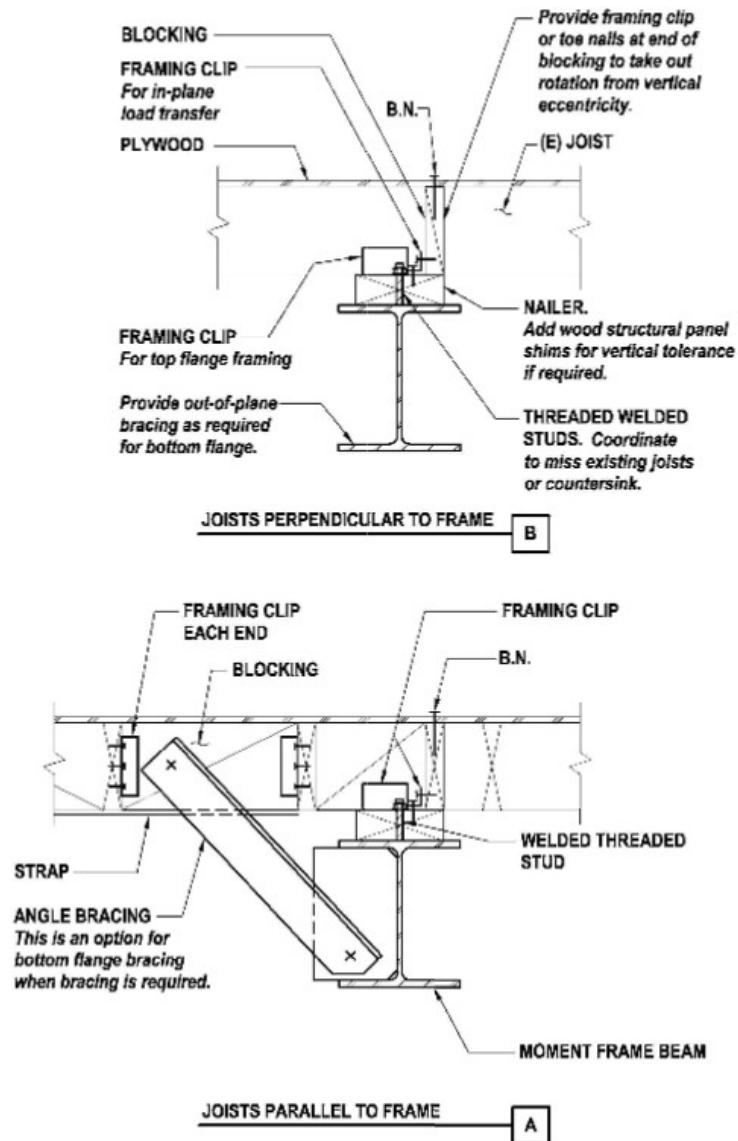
New Interior Steel Moment Frame to an Existing Wood Floor
